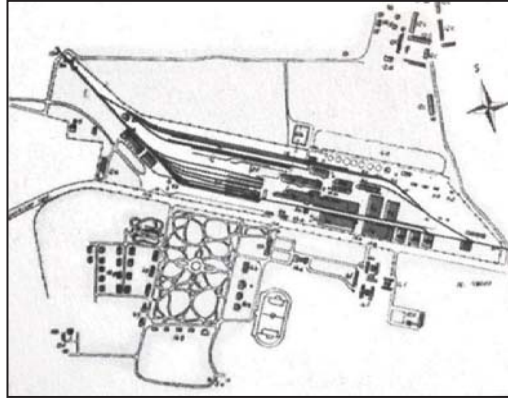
Plan of Factory Campus (Source: Ayhan, 2008)
